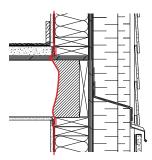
Floor rim joist interior air barrier redline detail (annotations not shown).
